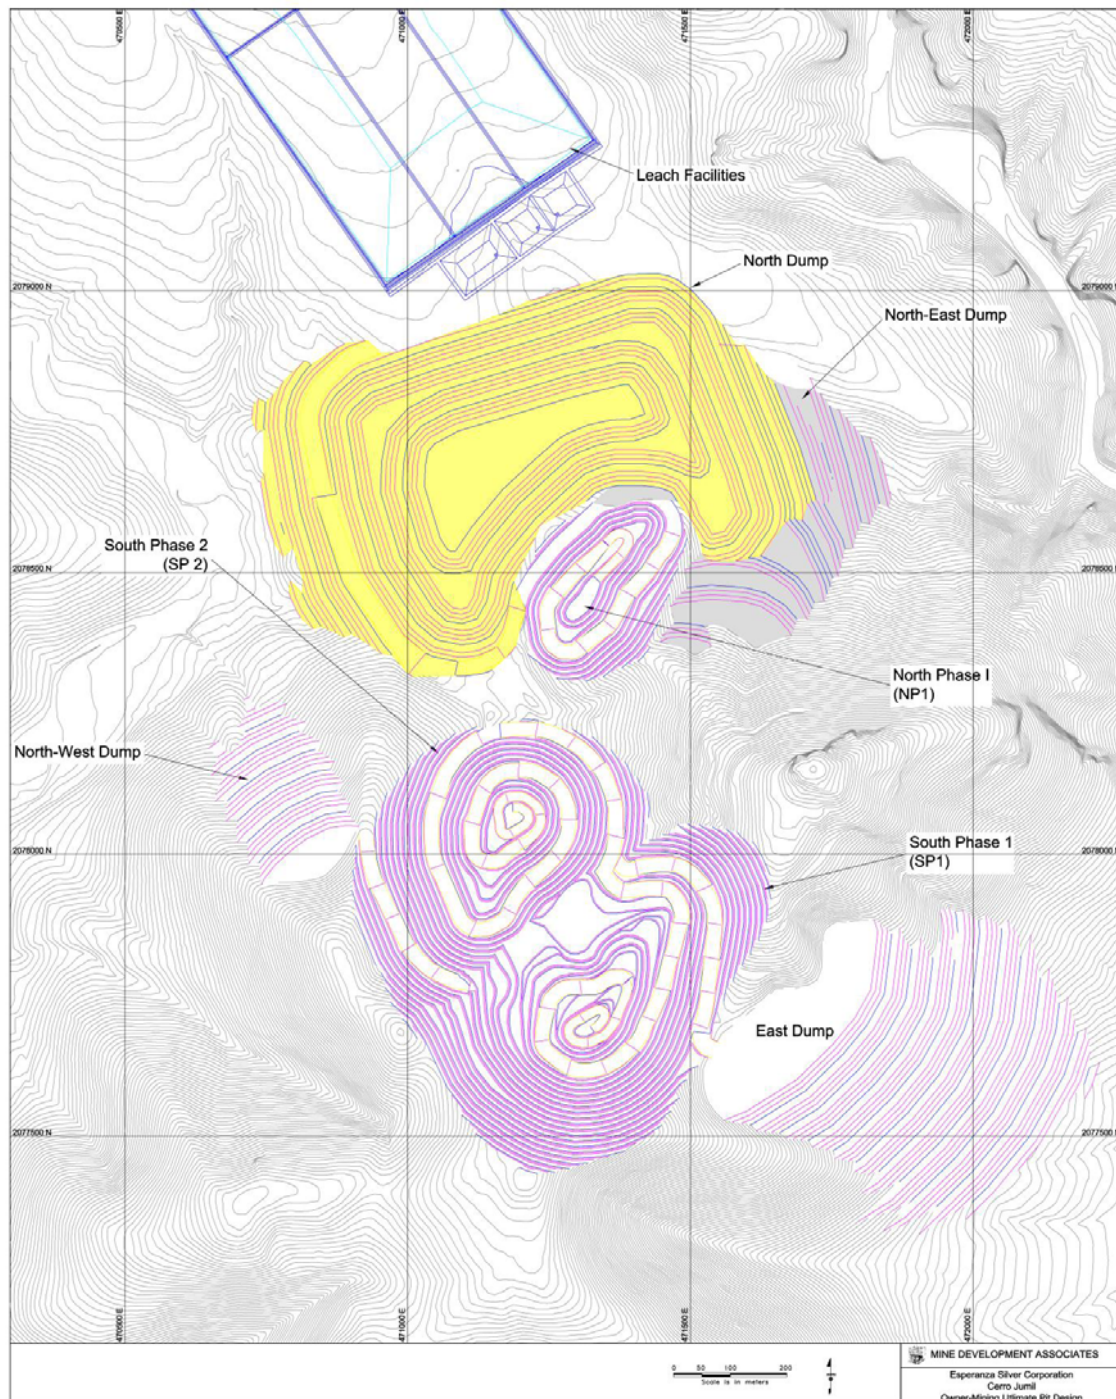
Owner – Mining Ultimate Pit Design
